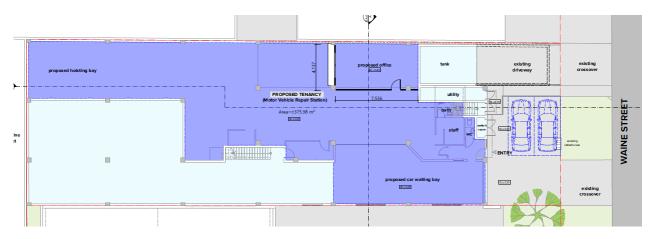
Proposed Area of the new Vehicle Repair Station Use (Source: Architectural Plans)
